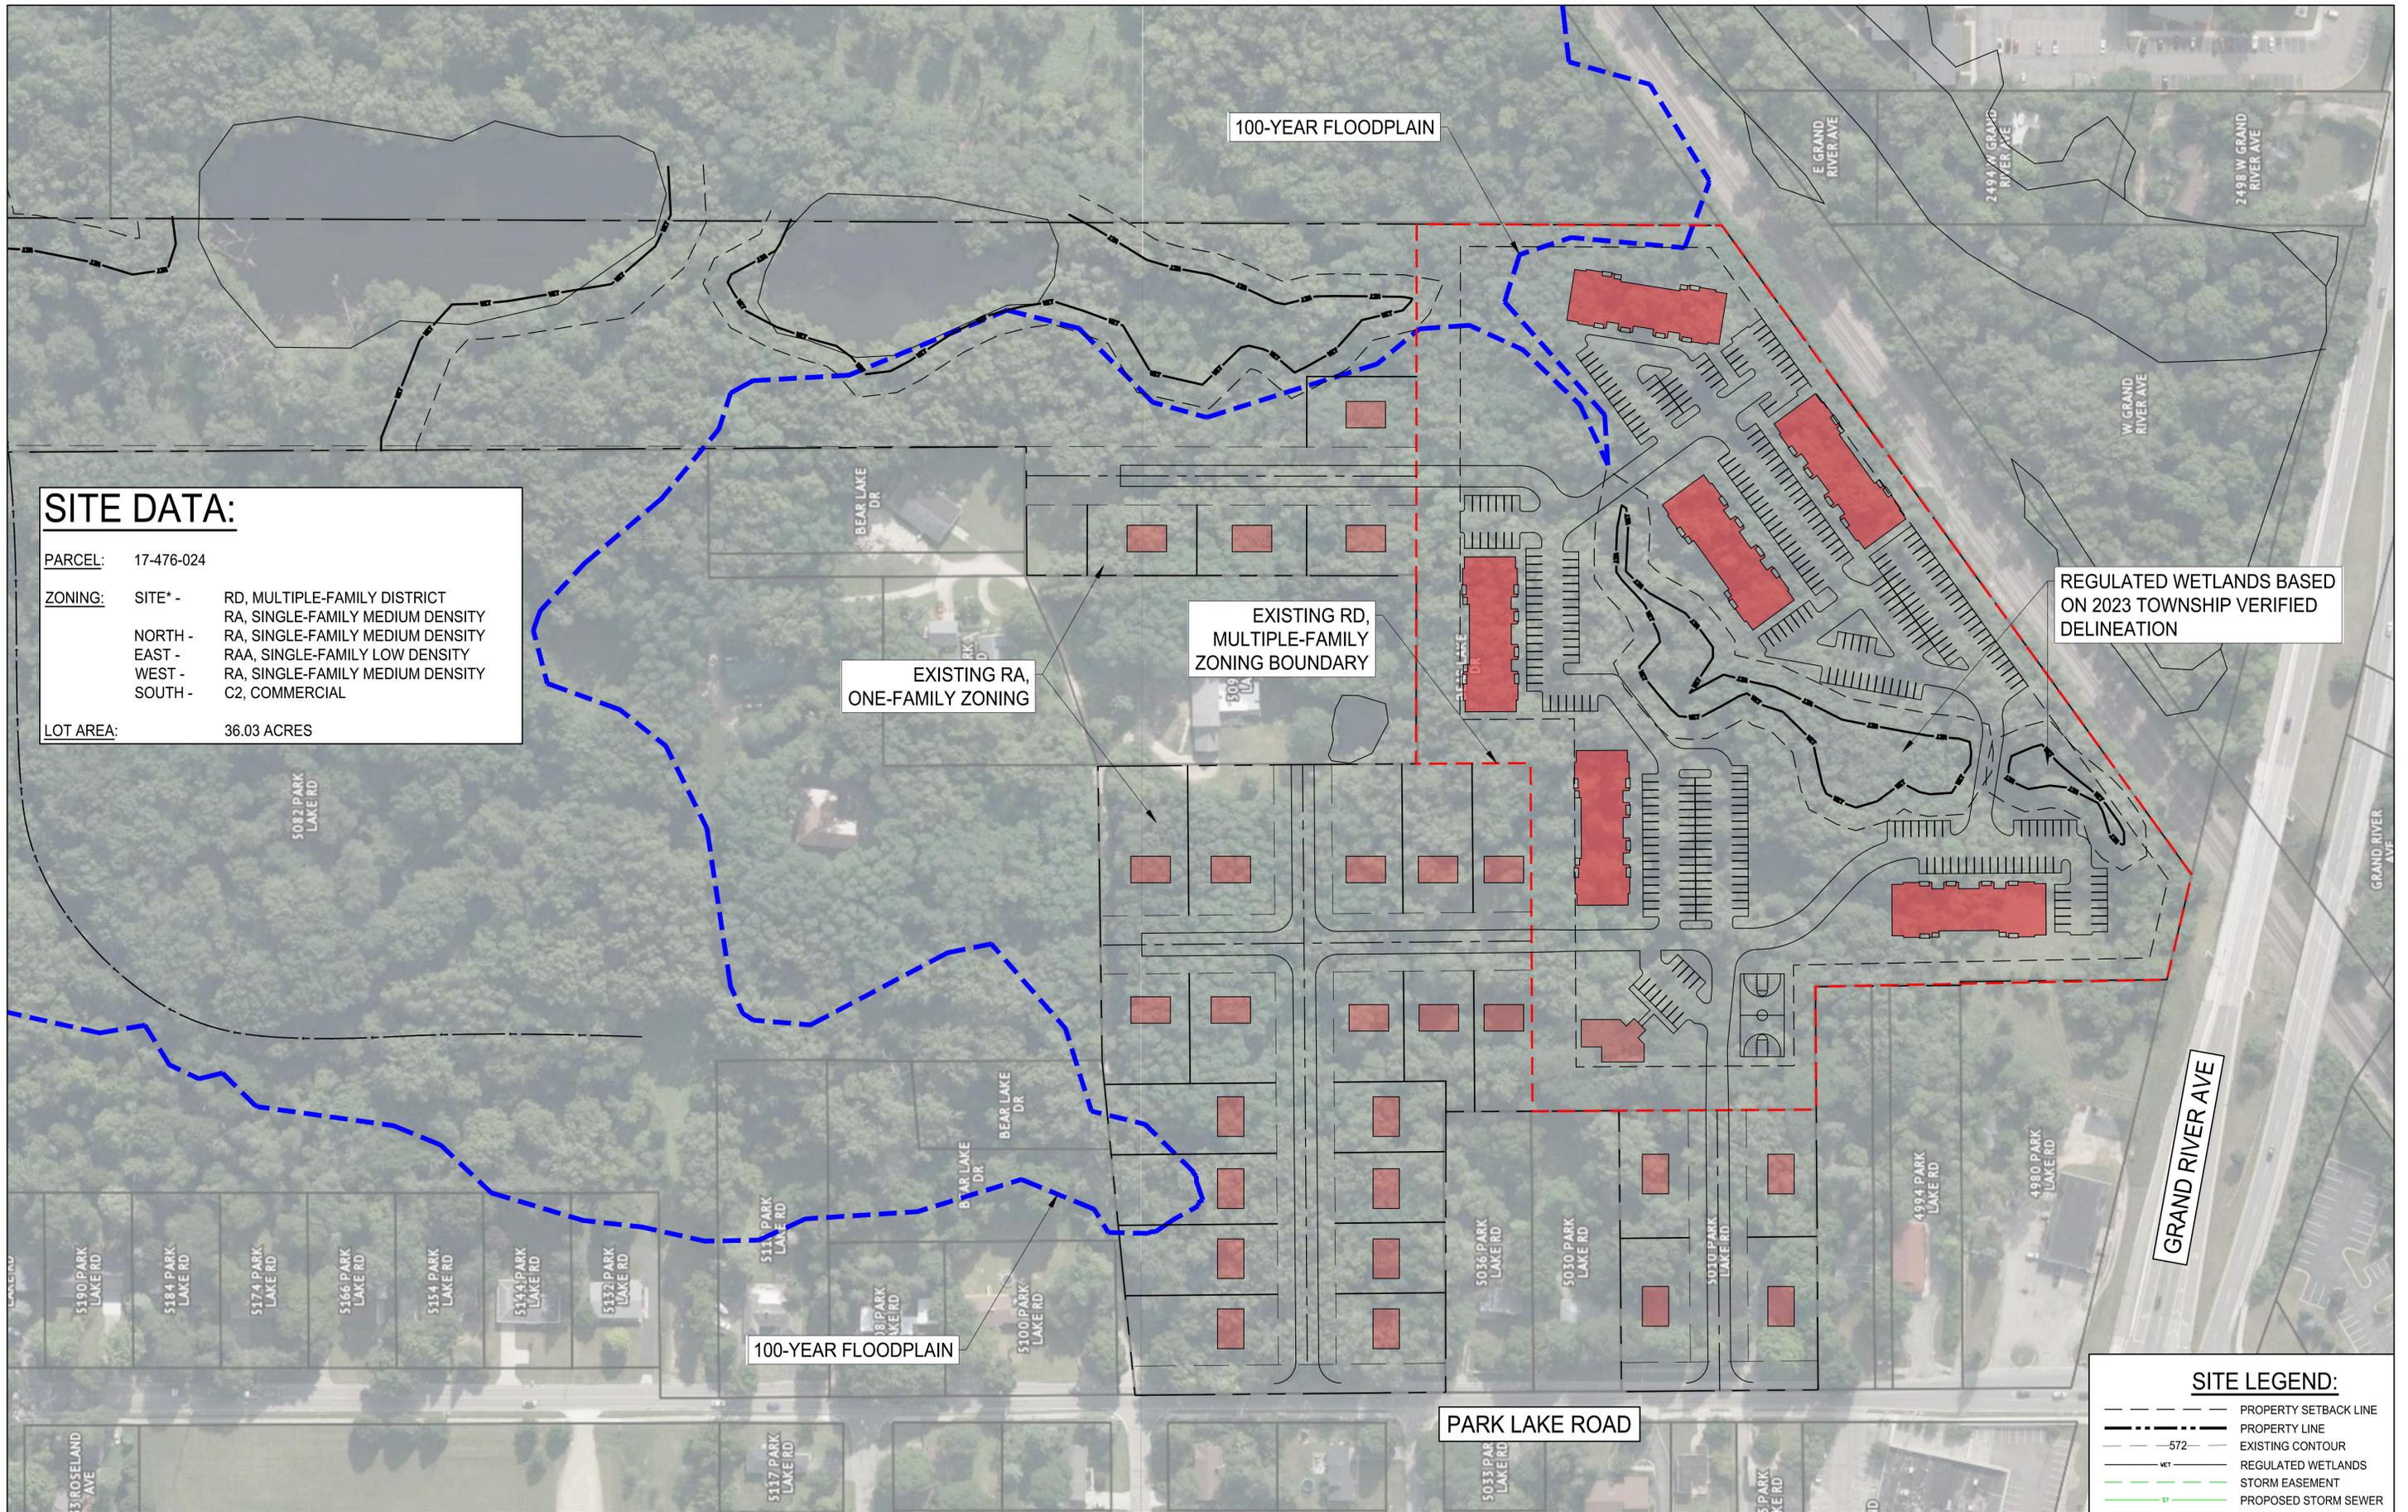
Exhibit D – Conceptual Site Plan Under Existing Zoning Districts
